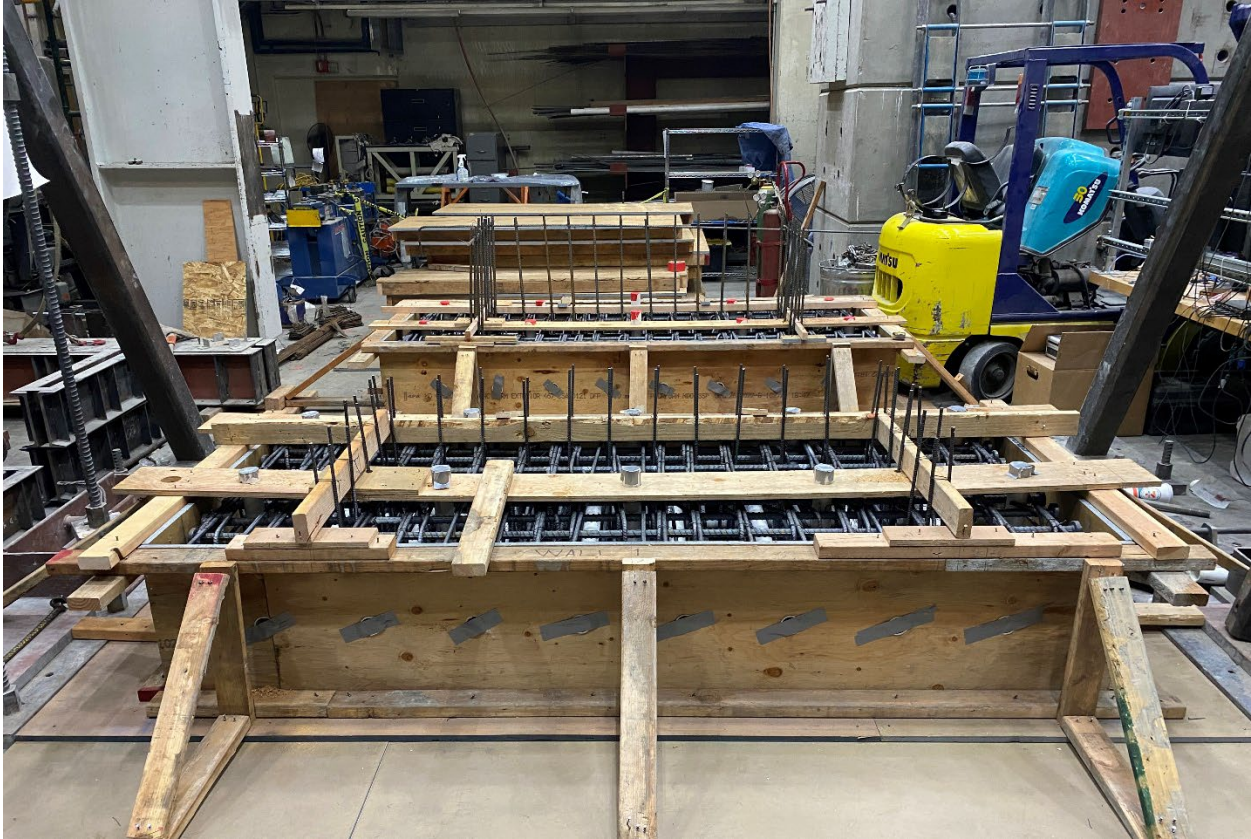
Footing formwork, (Bottom) CW-1, (Top) CW-2
